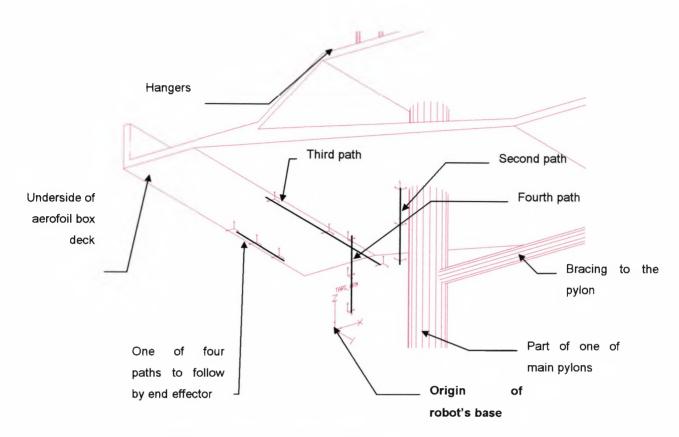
Bridge Detail [E2] according to Table 4.3
